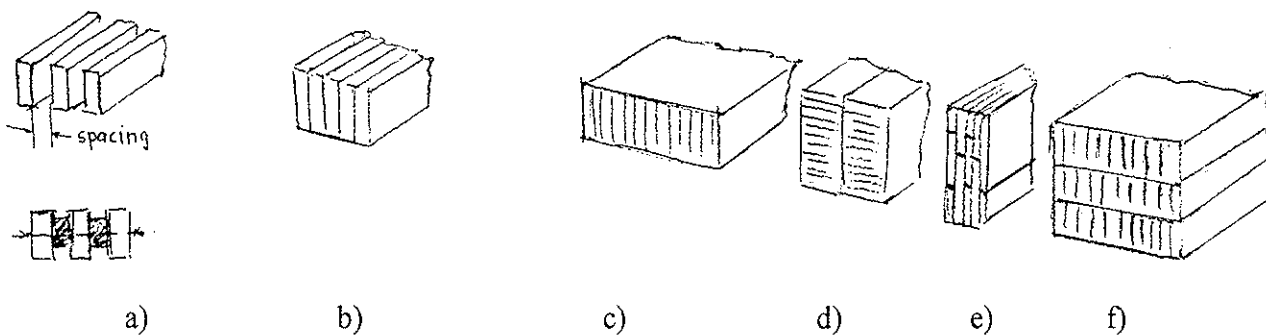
Types of deck systems: a) stringer deck, individual laminations cross-linked by connectors, b) nail-laminated or stress-laminated sawn timber deck, c) glued laminated deck, d) glued and stress-laminated, e) glued laminated and steel reinforced, f) glued and stress-laminated and steel reinforced
